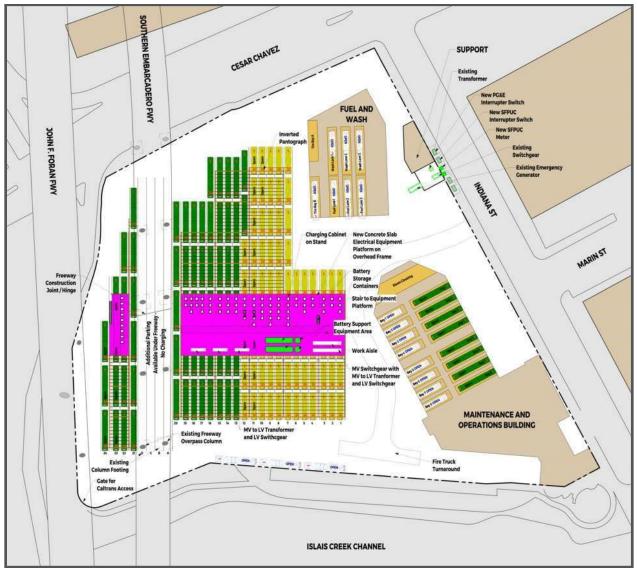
Islais Creek Yard - Full ZEB Build-Out
